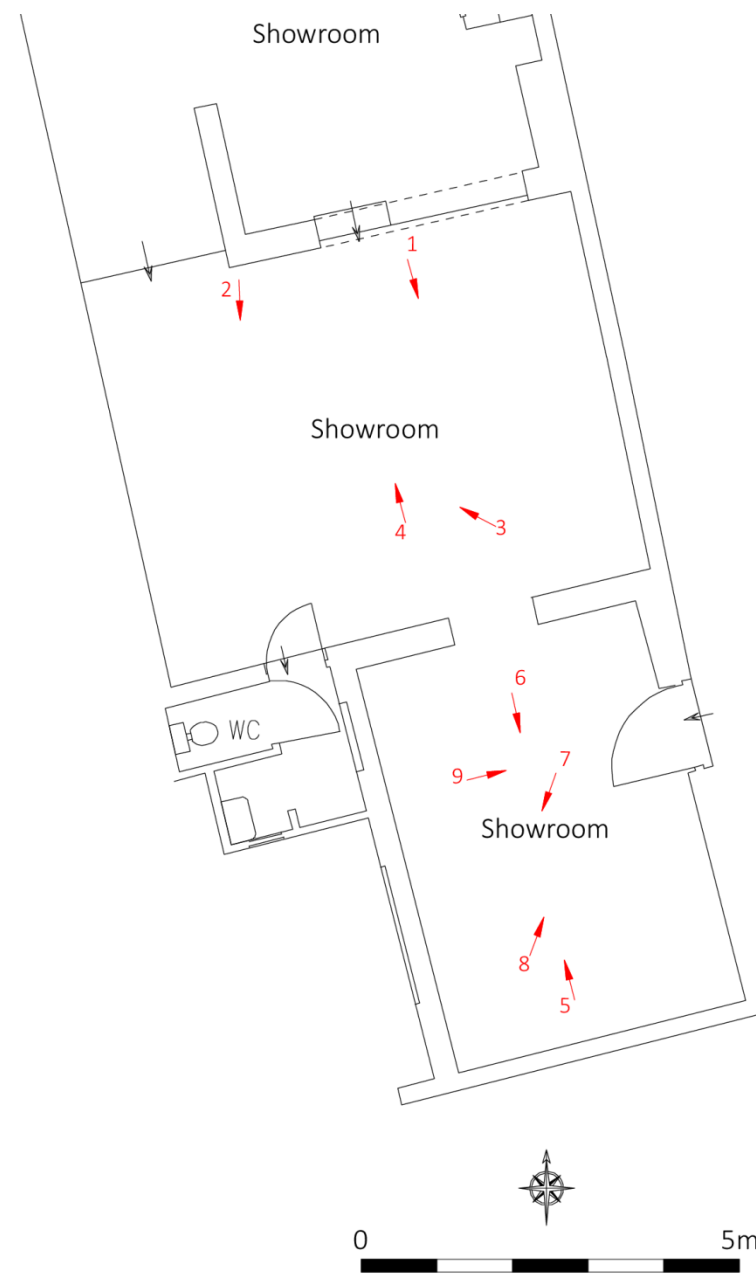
Dillamore's Furnishing: rear section interior photo plan (scale 1:100)
